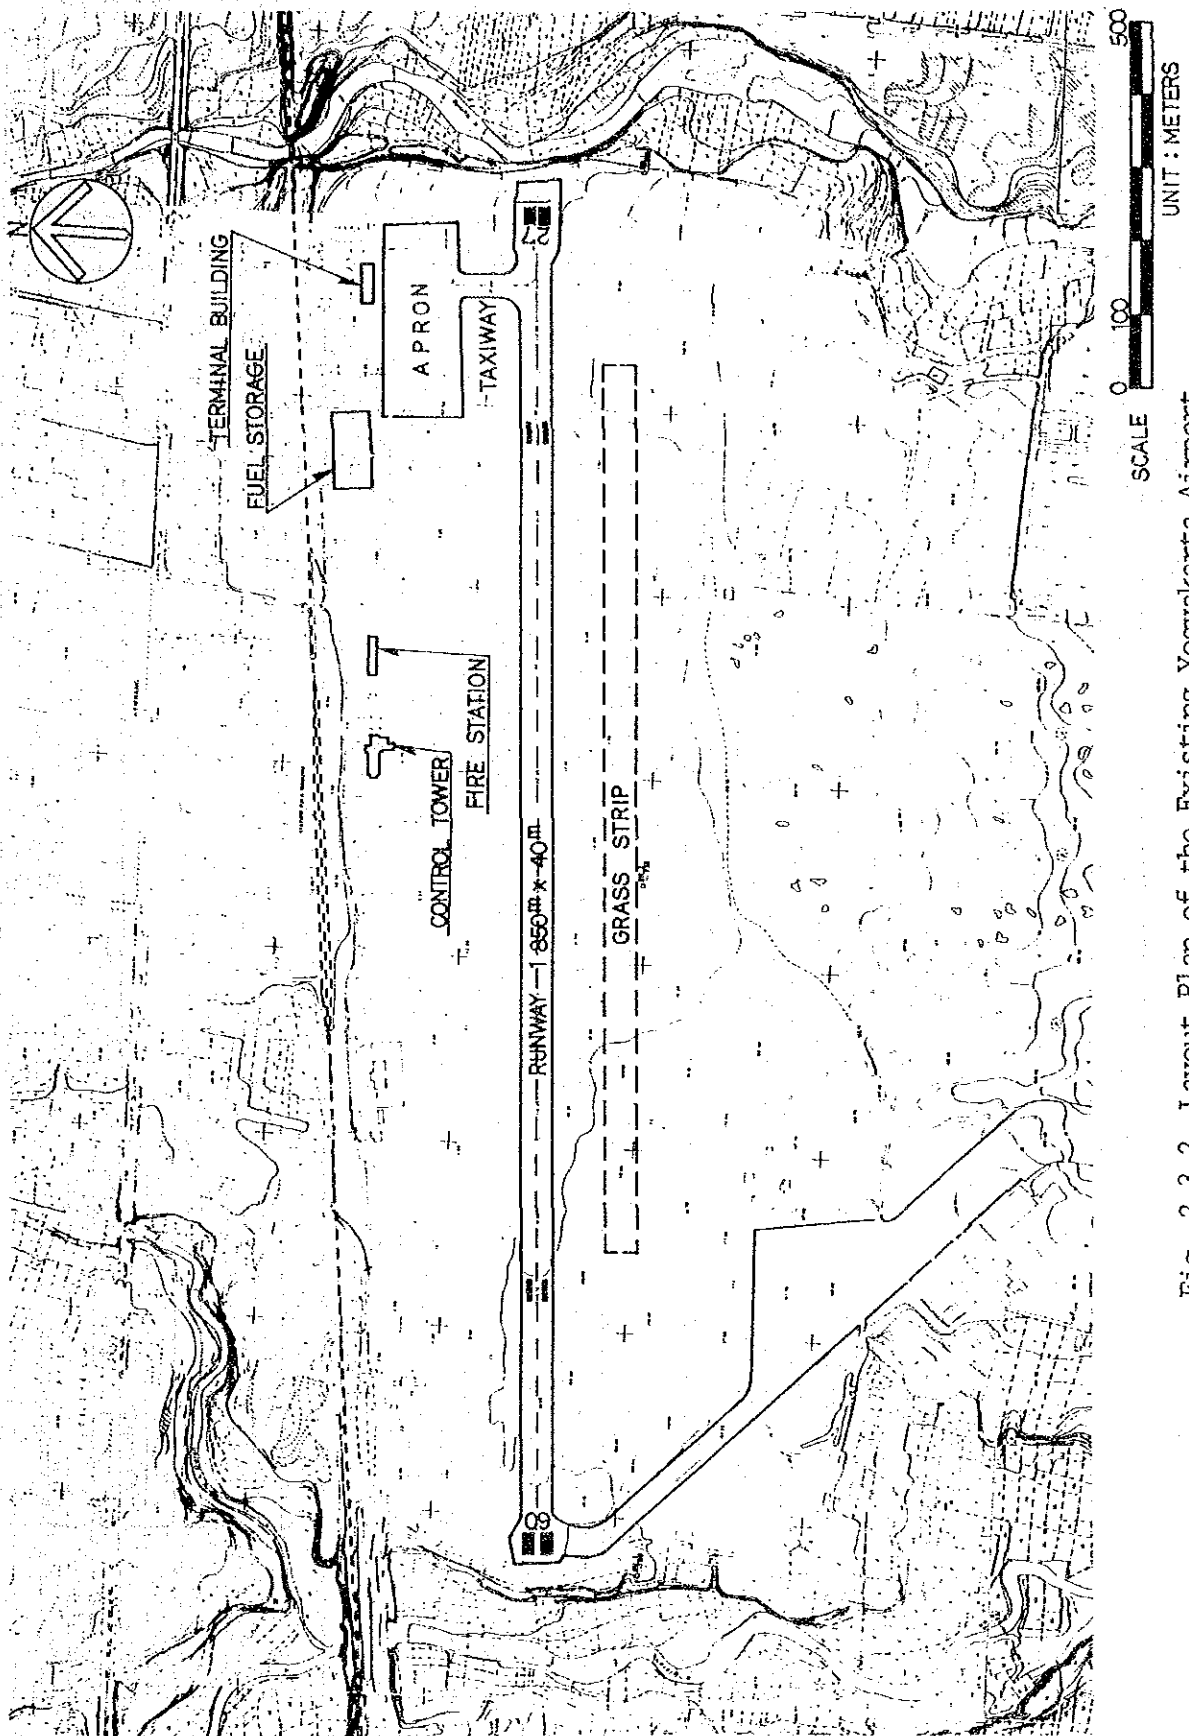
Layout Plan of the Existing Yogyakarta Airport
